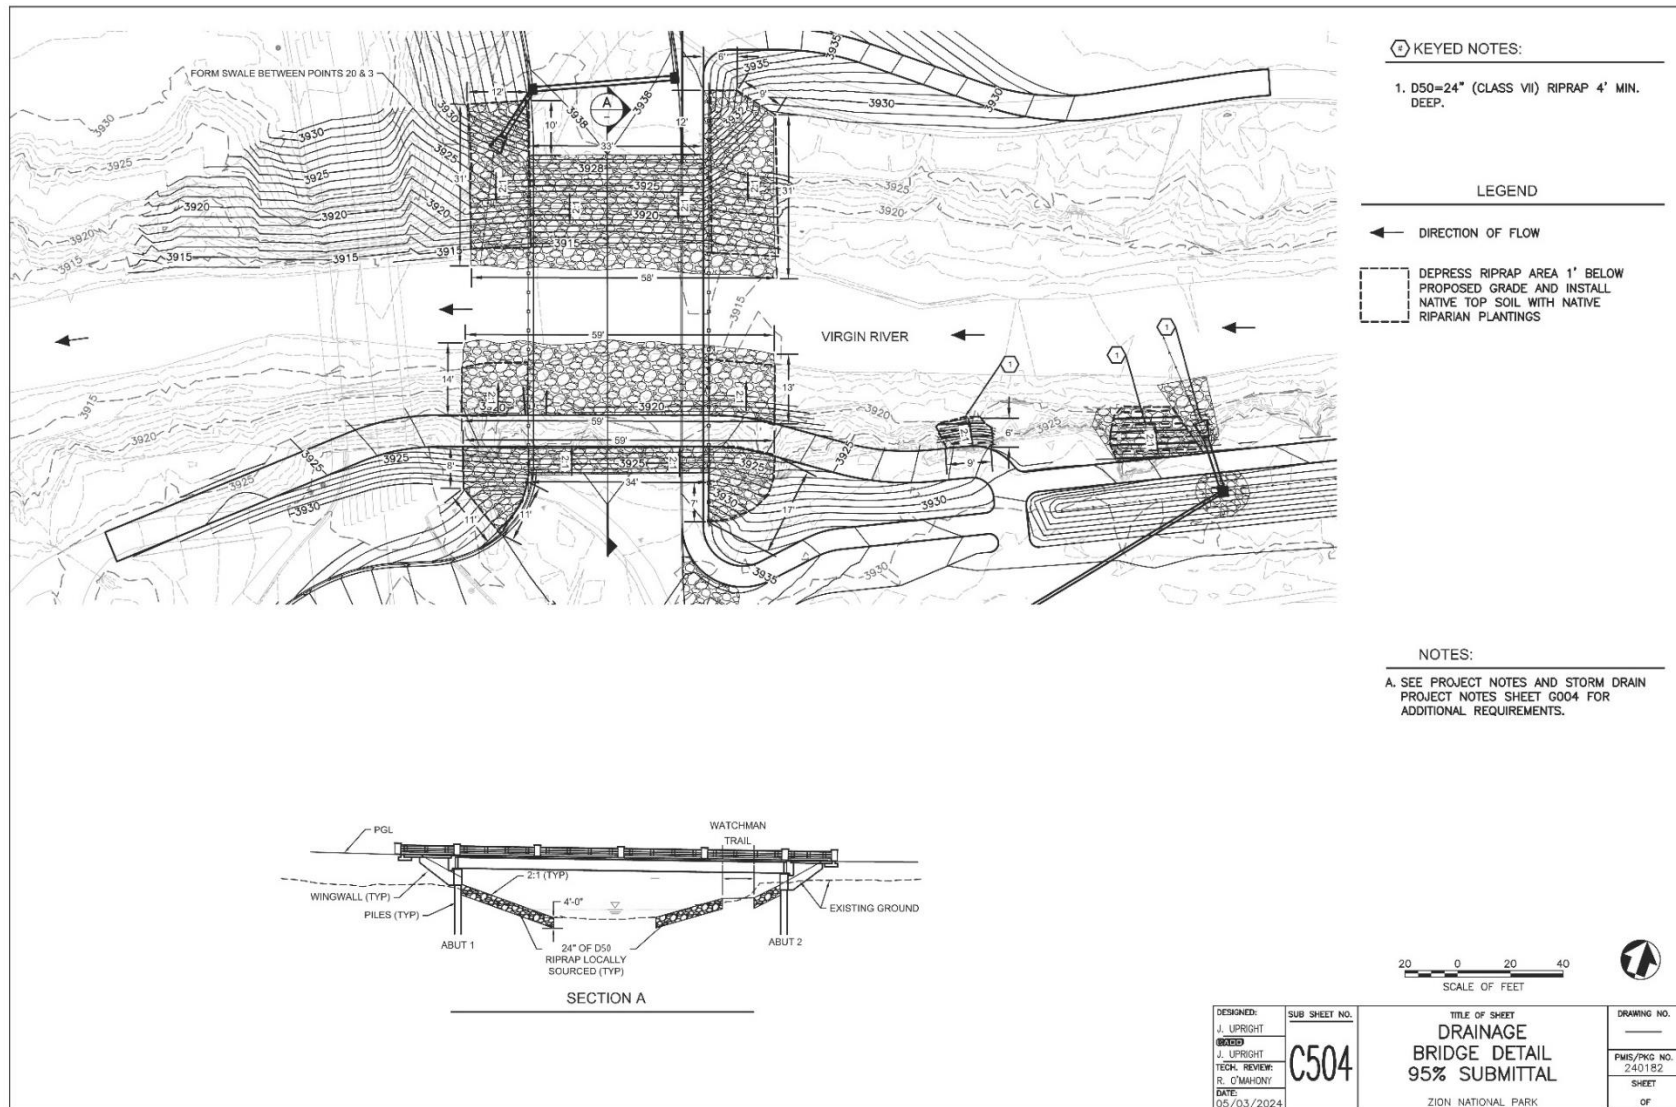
Riprap and Grading at New Bridge Over North Fork of the Virgin River
